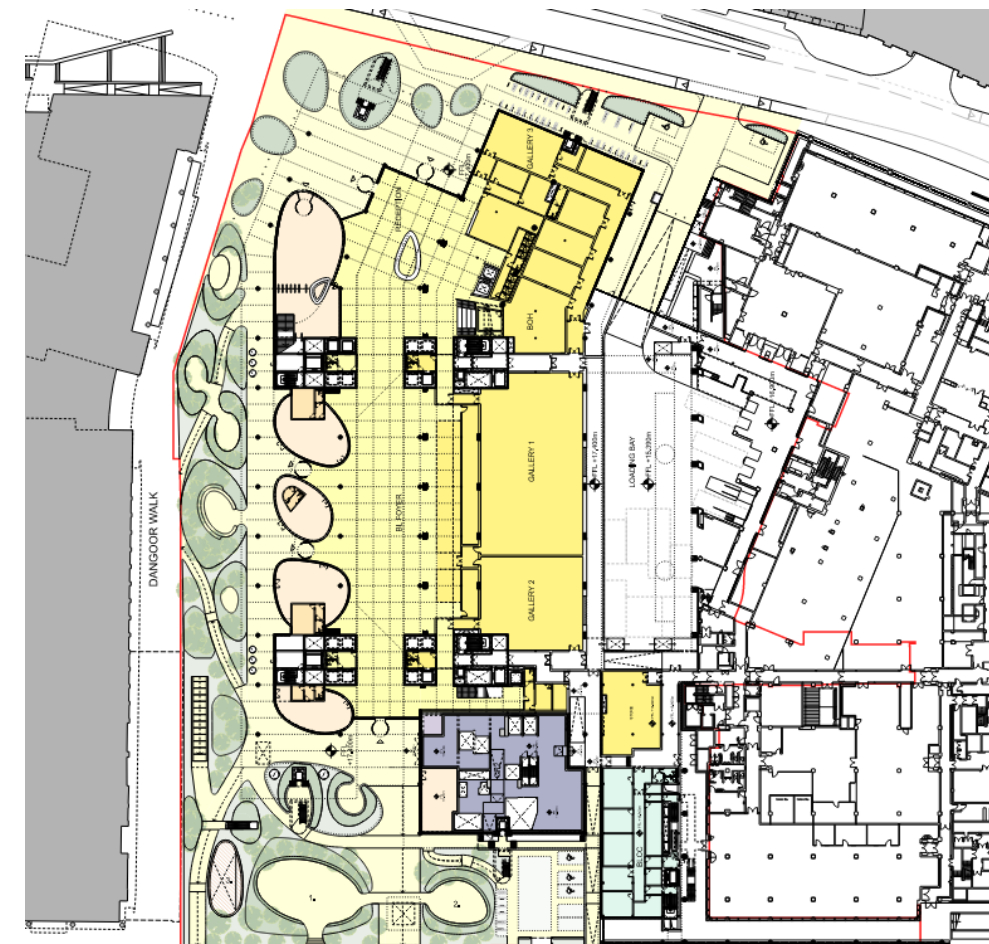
Proposed Lower Ground floor plan (RSHP, 24-09-2021)
